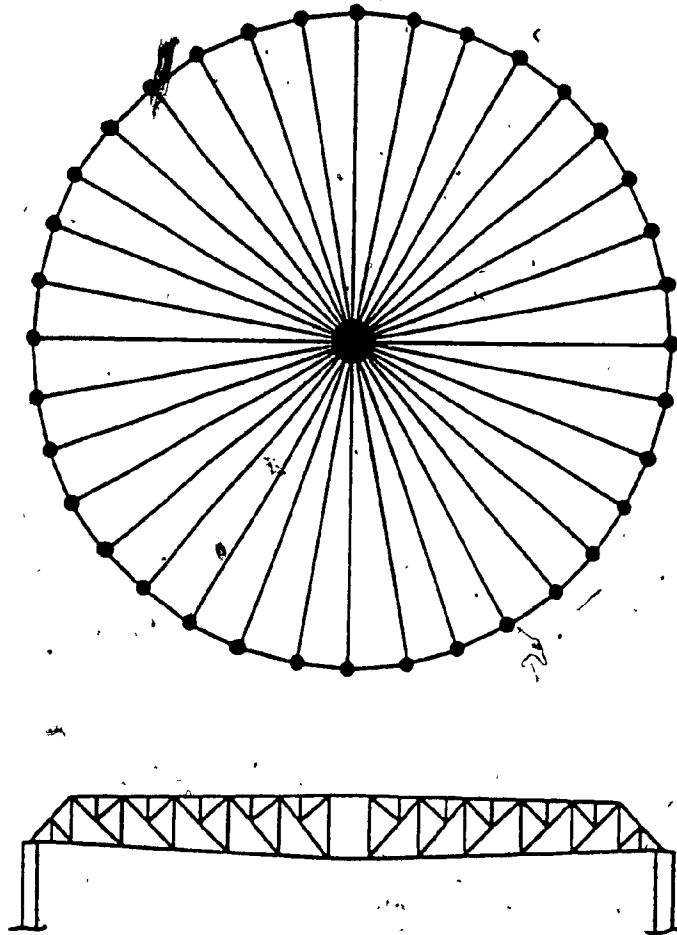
PLAN VIEW AND SECTION OF A RADIAL TYPE TRUSS.
